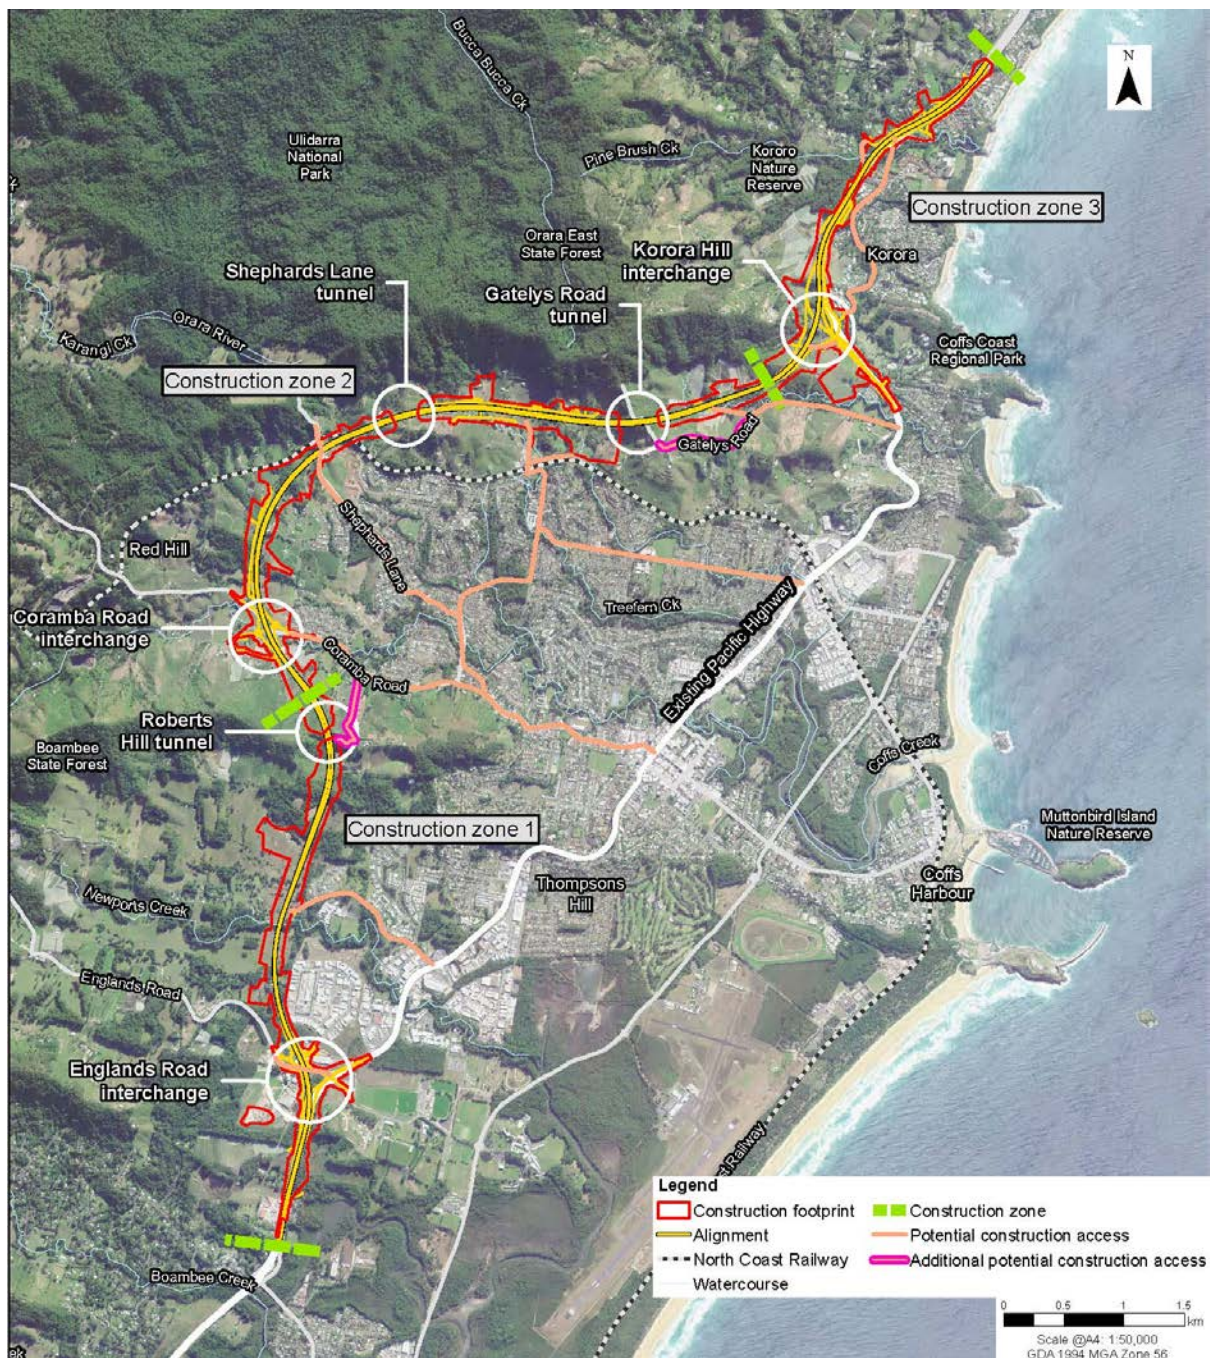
| Proposed construction zones (Source: Amendment Report Appendix B)
